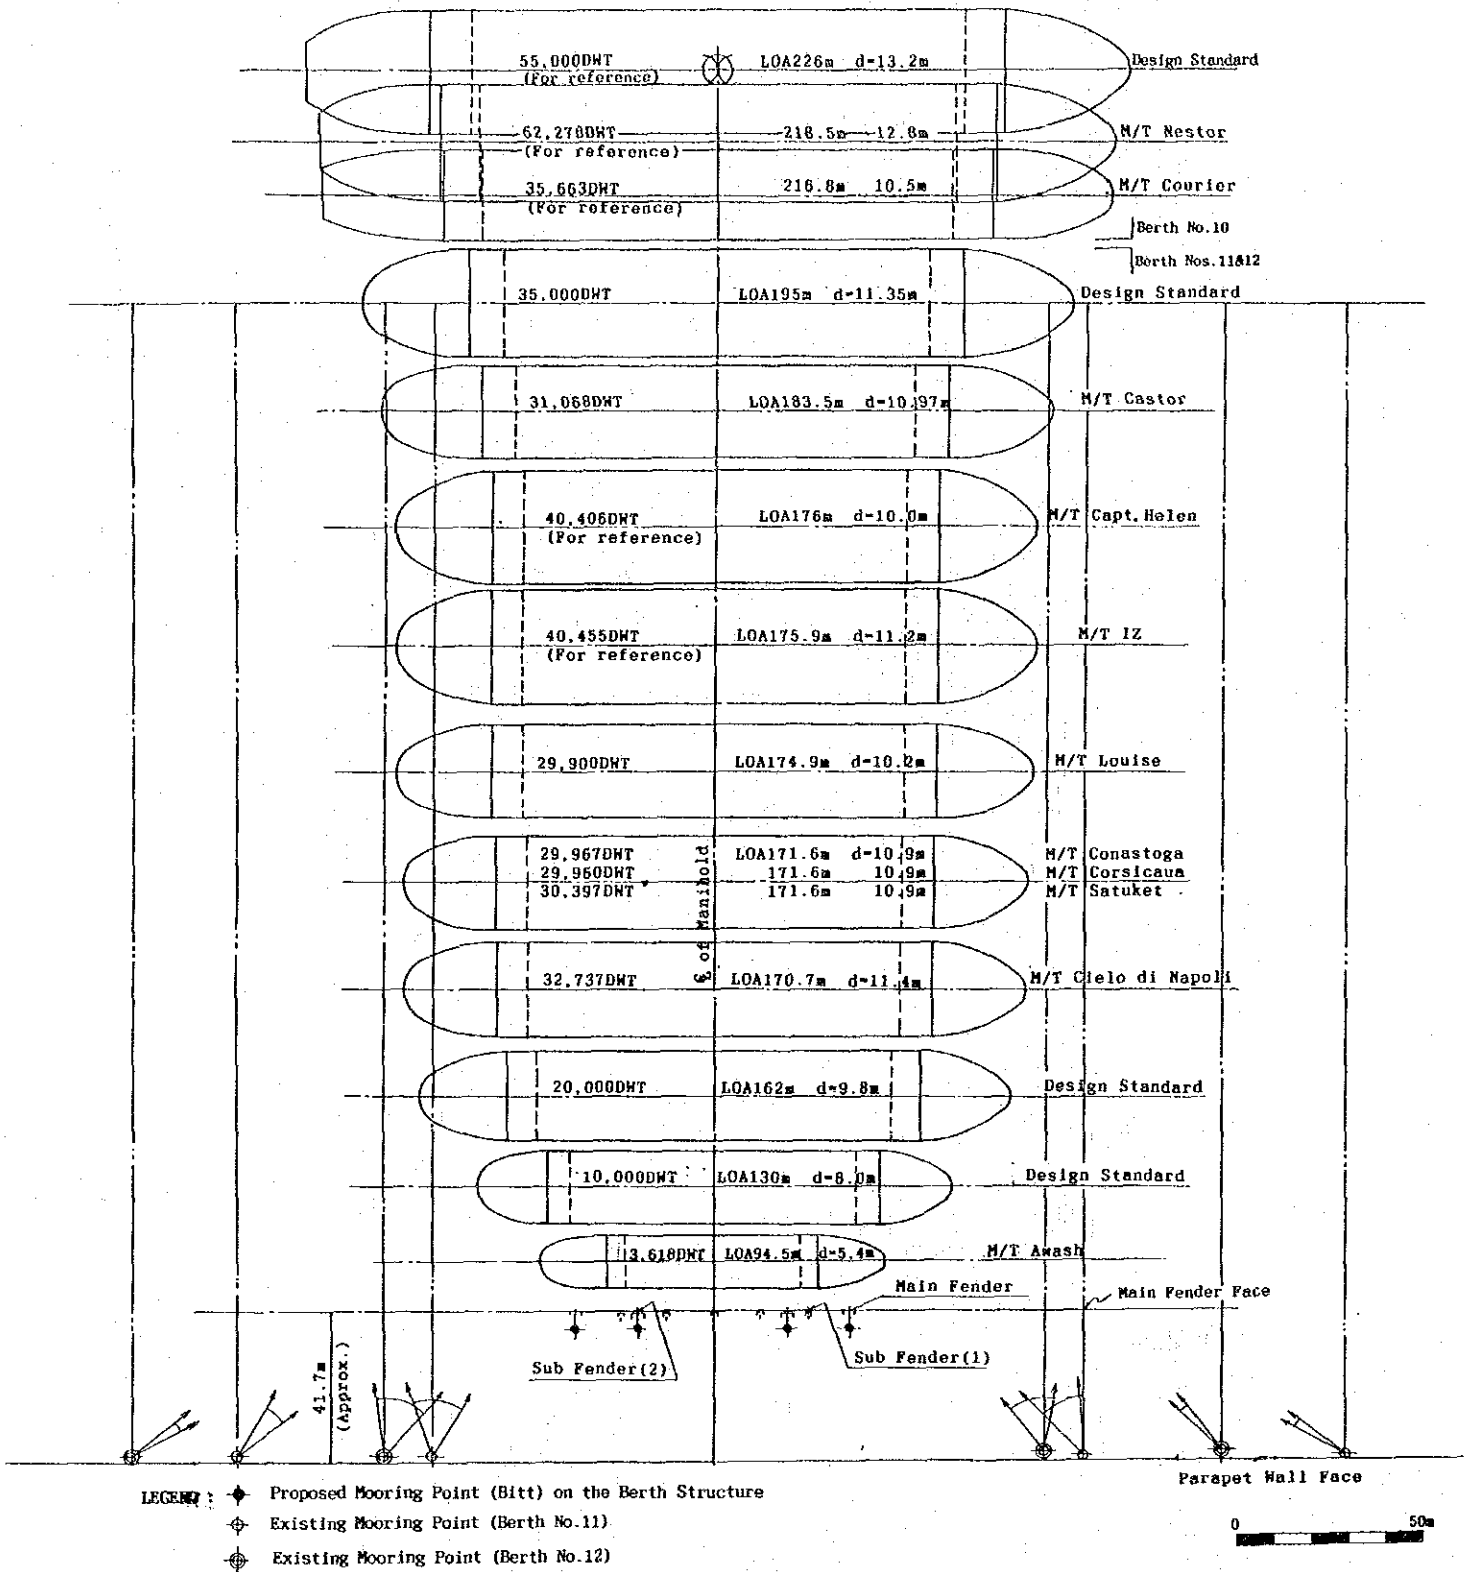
Various Ship Sizes and Arrangement of Berth Facilities
